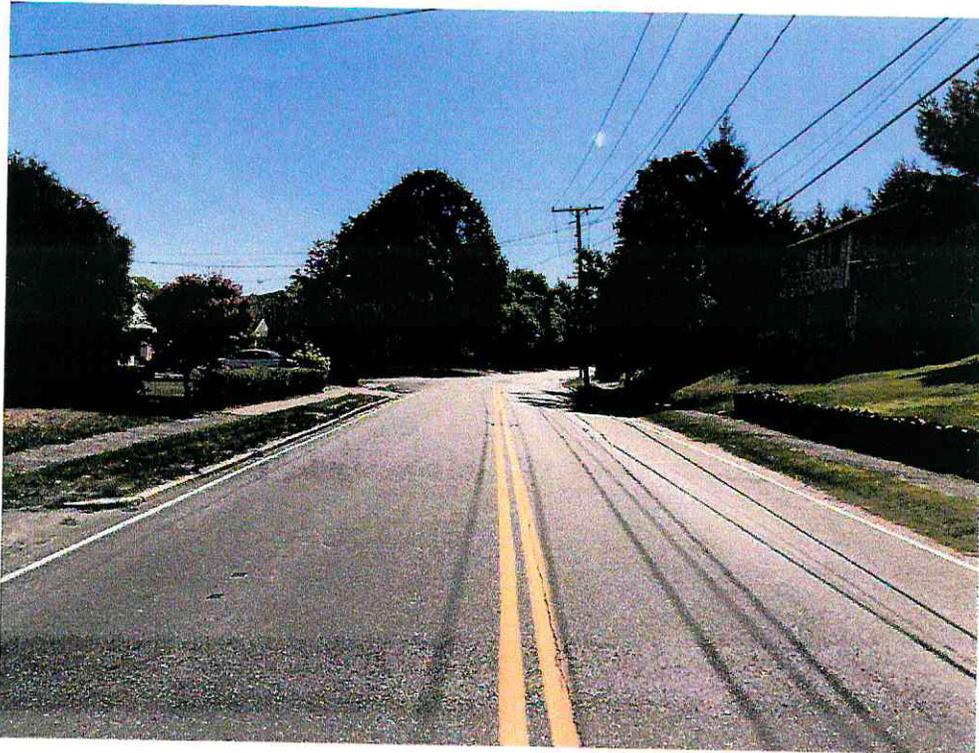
Location c – Cross St. looking east. 150' west of Cleveland St.
